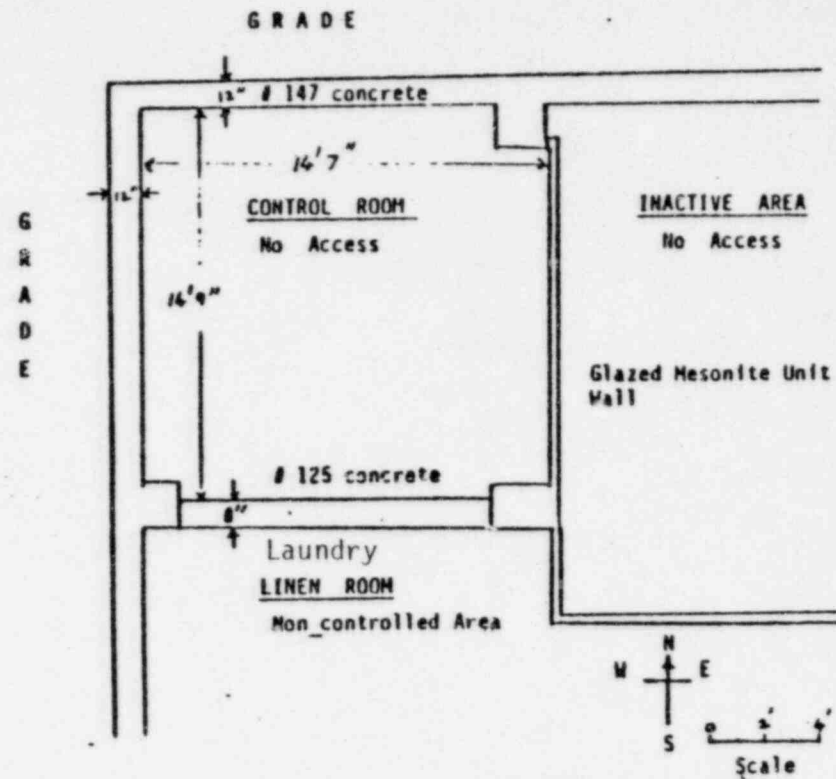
(B) : Partial Ground Floor Plan - Ceiling of Cobalt Room.
